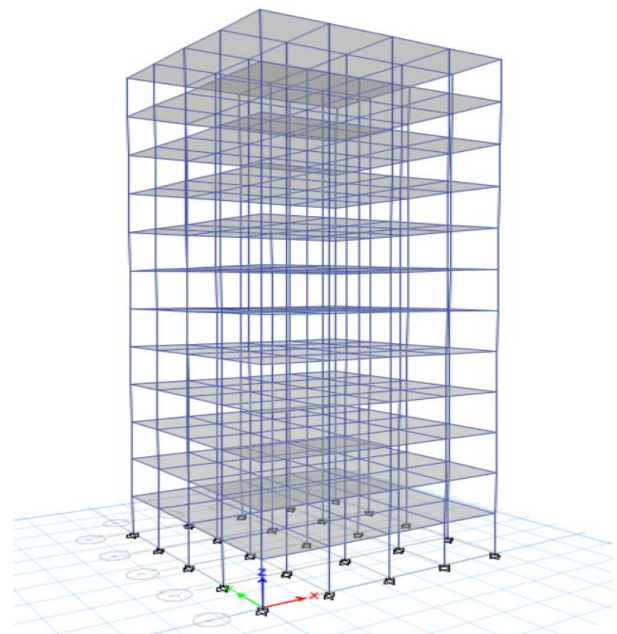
3D plan showing beam, column, floor, slab layout of the building in ETABS 2016
